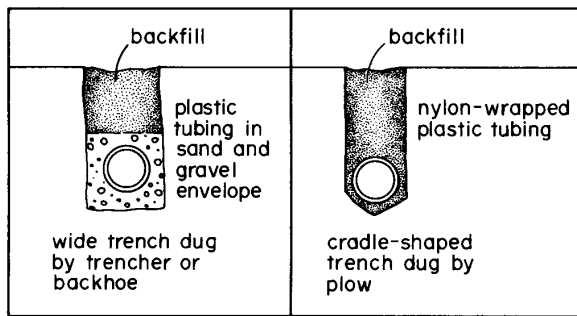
Typical filter systems (adapted from [5]). Note that nylon-wrapped plastic tubing allows a much narrower trench than tubing or pipe within a gravel and sand envelope.
